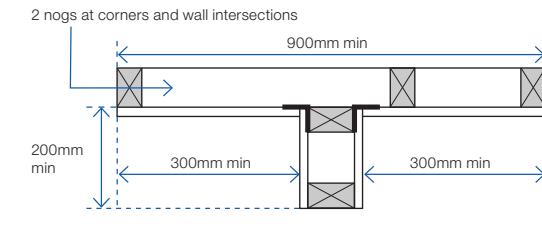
CORNER INTERSECTION (GIBFIX® FRAMING SYSTEM)
